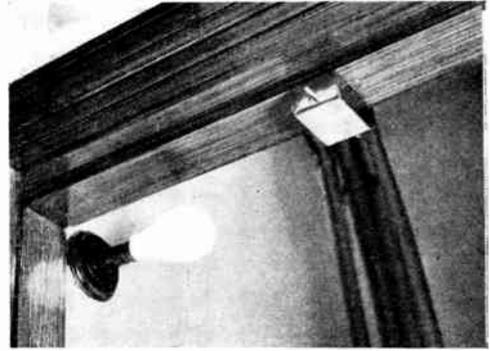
C.—AUTOMATIC DOOR SWITCH IN POSITION.
